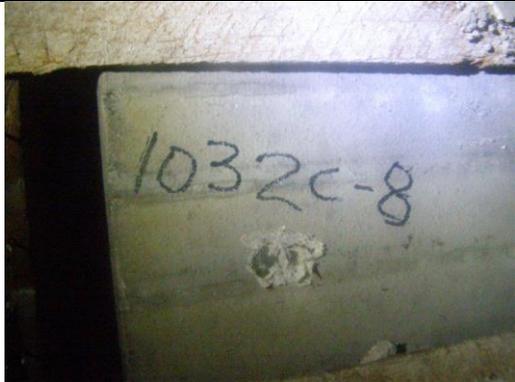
Duct Work Boots (1032C-8) Living Room,
